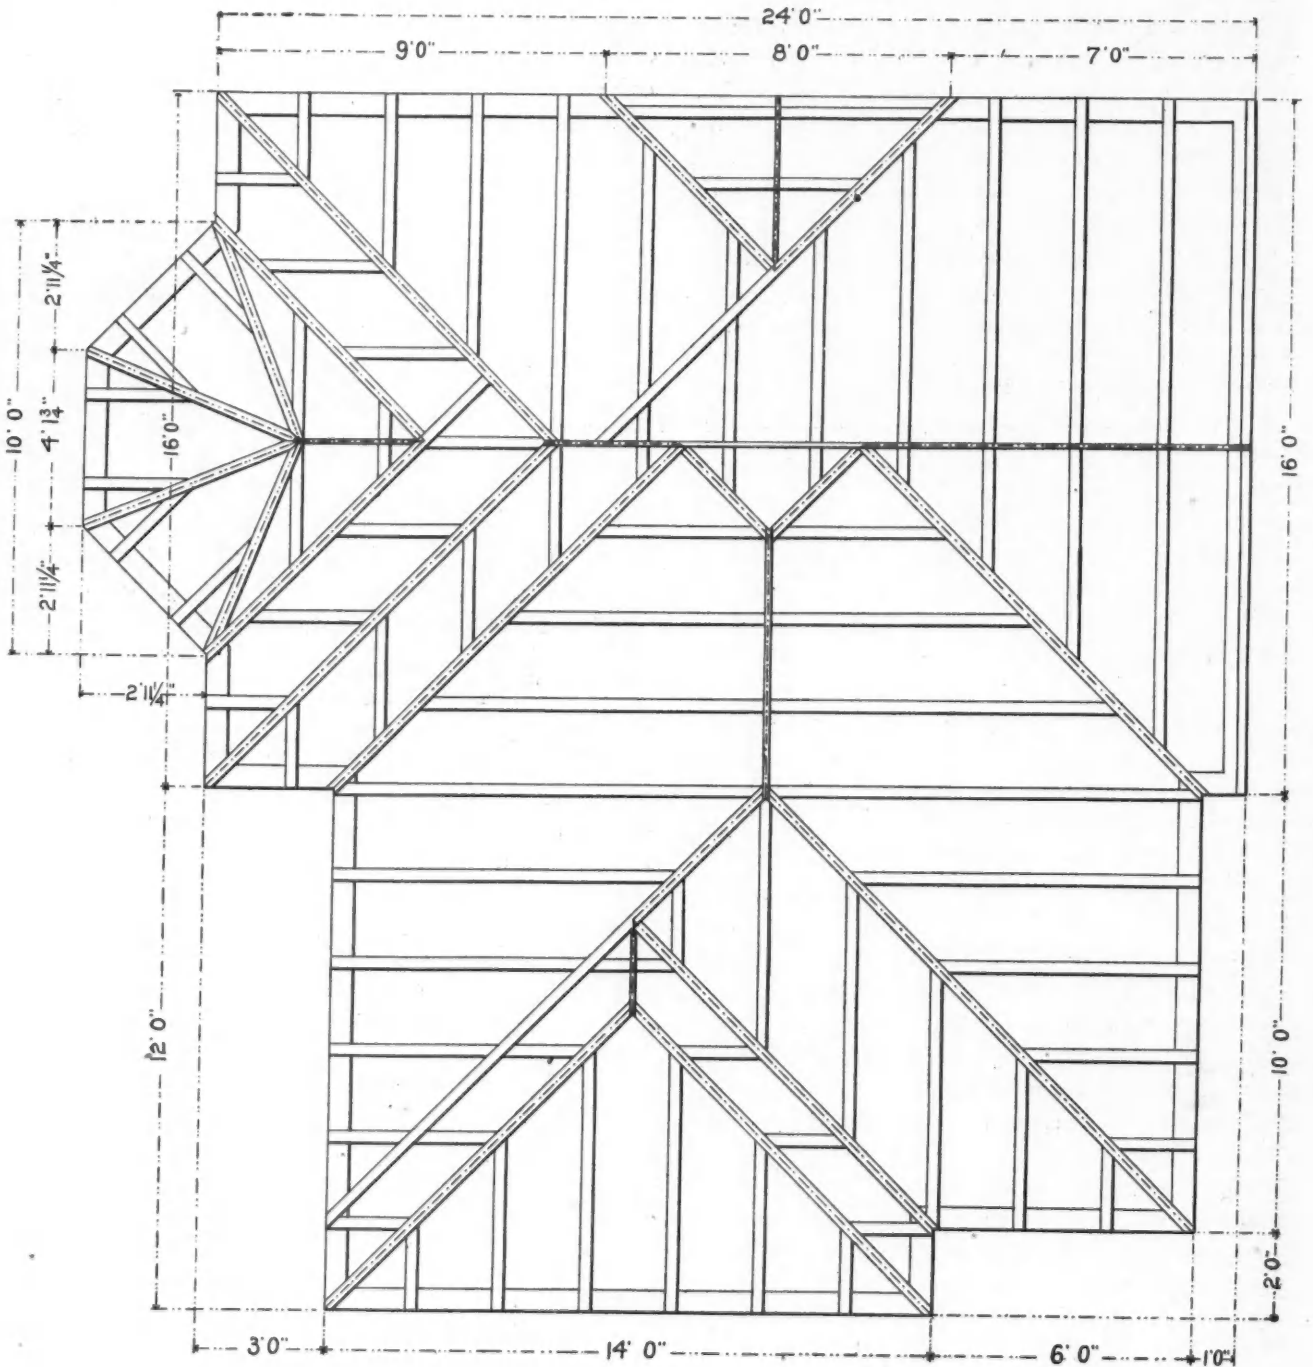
Plan Showing Roof with Right-Angled Corners and Octagonal Bay. This Answers for Any Pitch.
